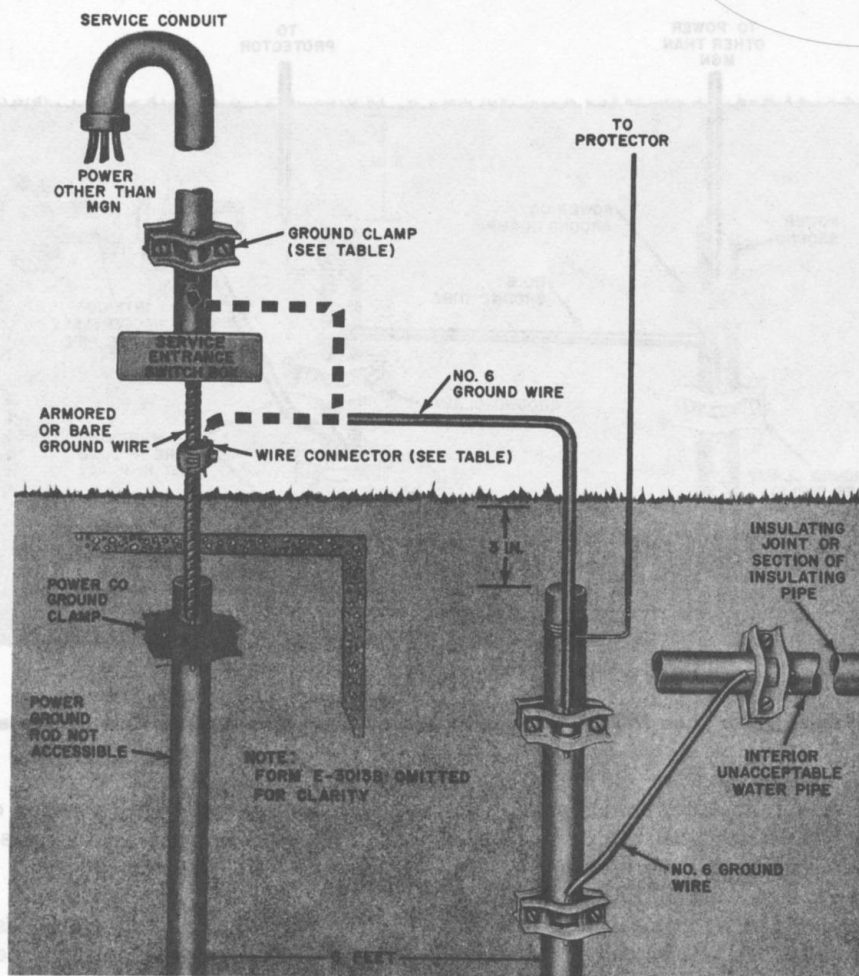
Power Other Than MGN Grounded to Inaccessible Ground Rod—Unacceptable Interior Water System
